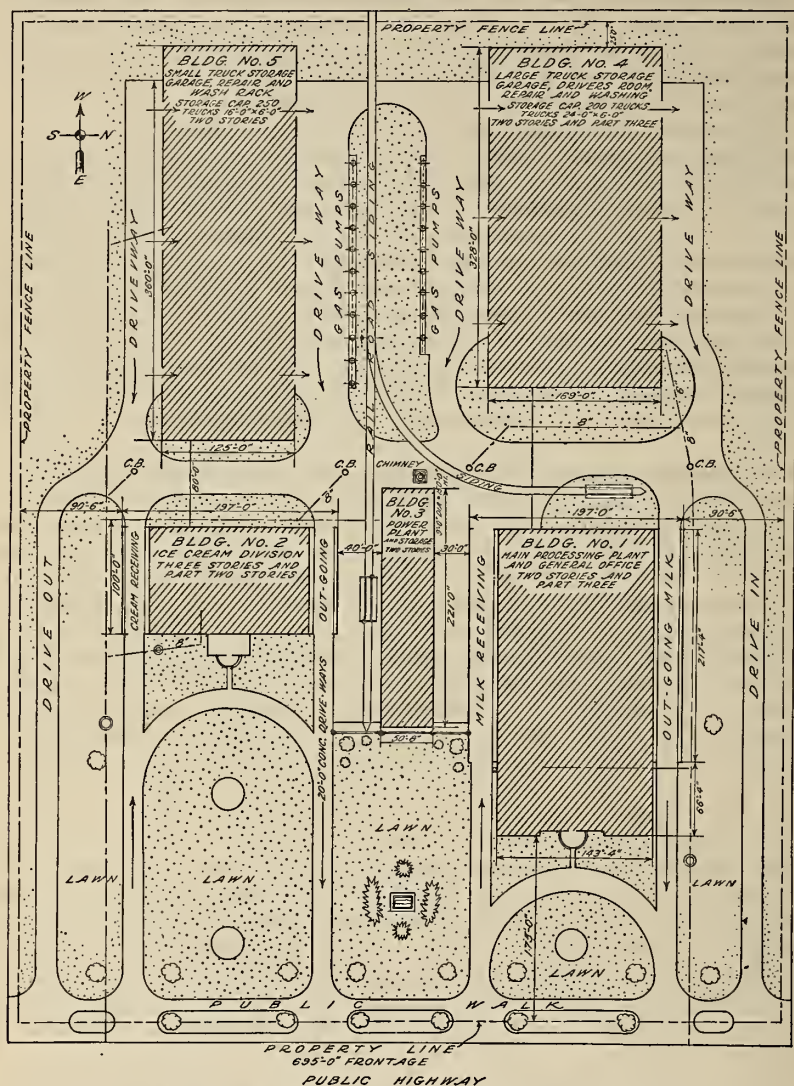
Plot plan for the main central plant of the proposed unified system.
